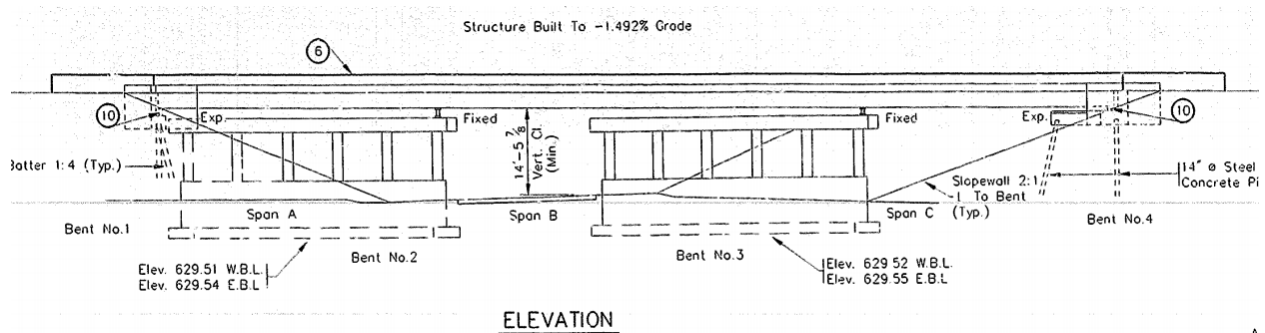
Elevation View of the Bridge (NBI 49120) (1991)
